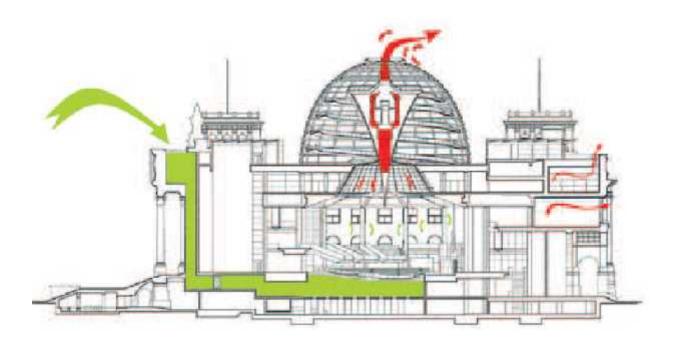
Natural ventilation and lighting concept the Berlin Parliament House
